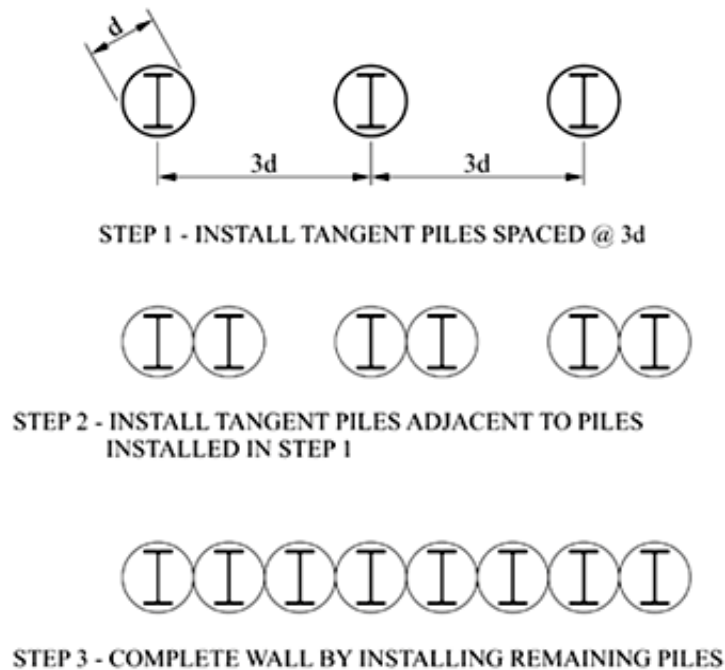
Tangent pile wall construction sequence (C. Jeremy Hung et al 2009)
